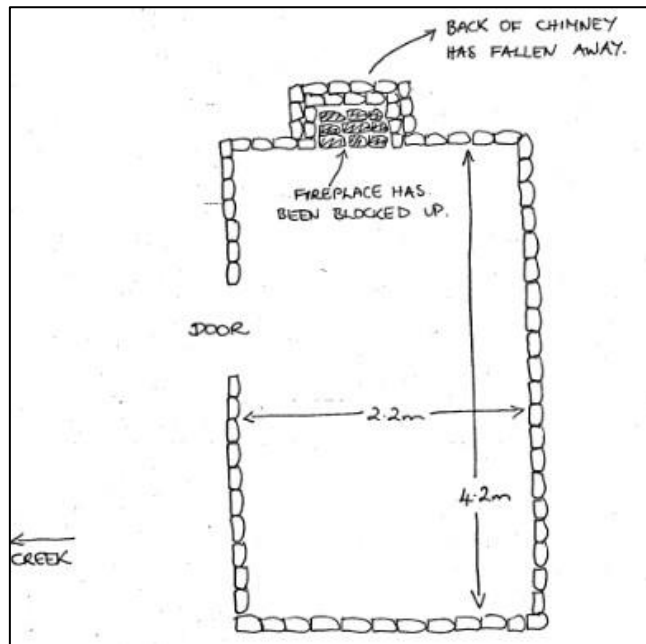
Sketch plan of G41/267 from 1980 site record form.
